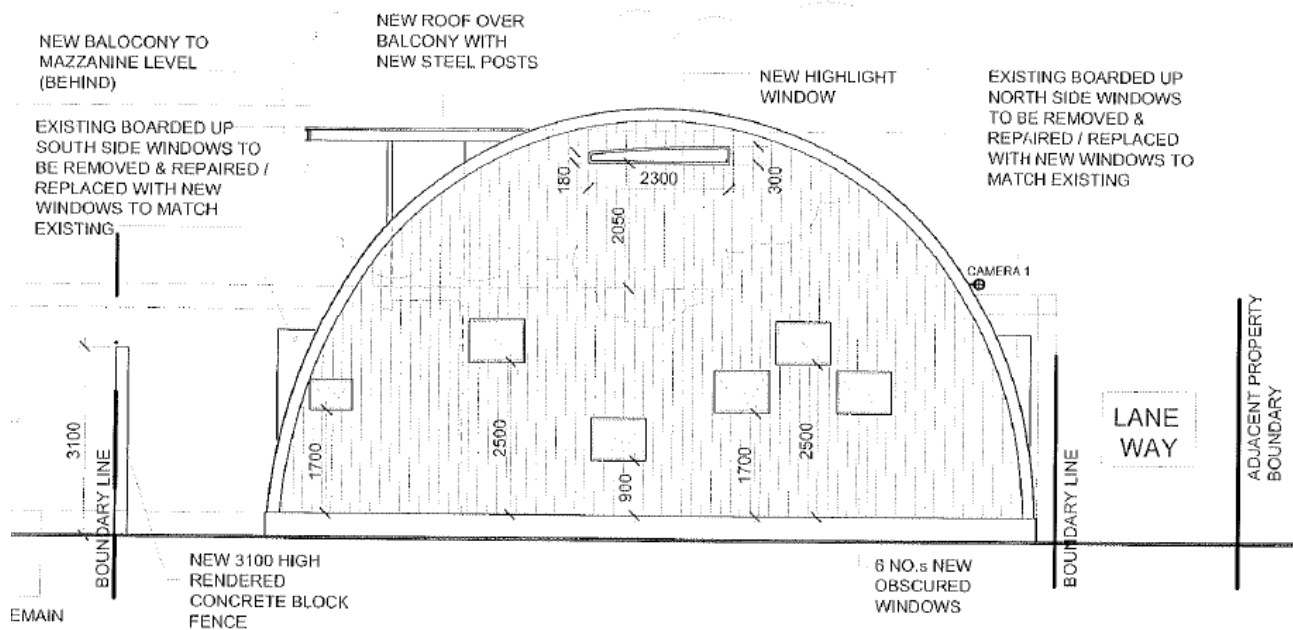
East elevation showing proposed works. Drawing dated 2009 (YCC BP).
